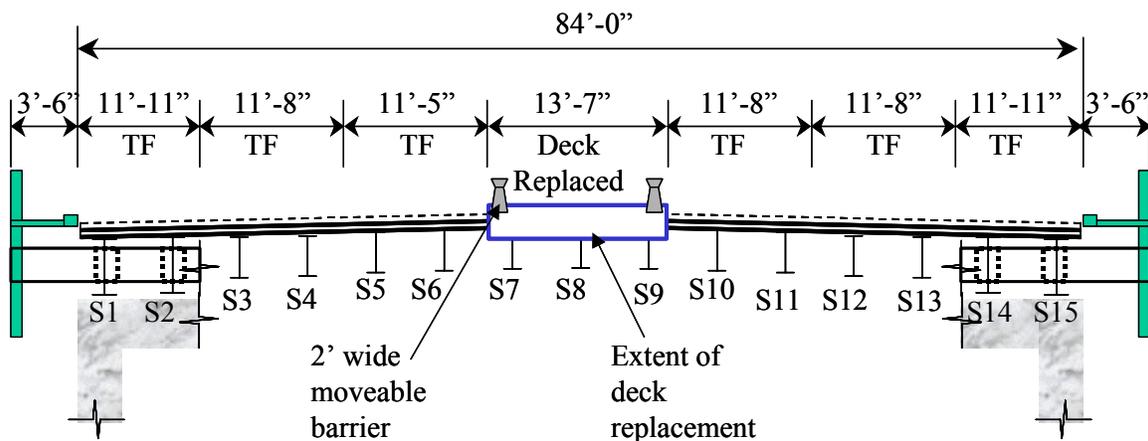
Extent of deck replacement on the west trestle spans (not to scale).
